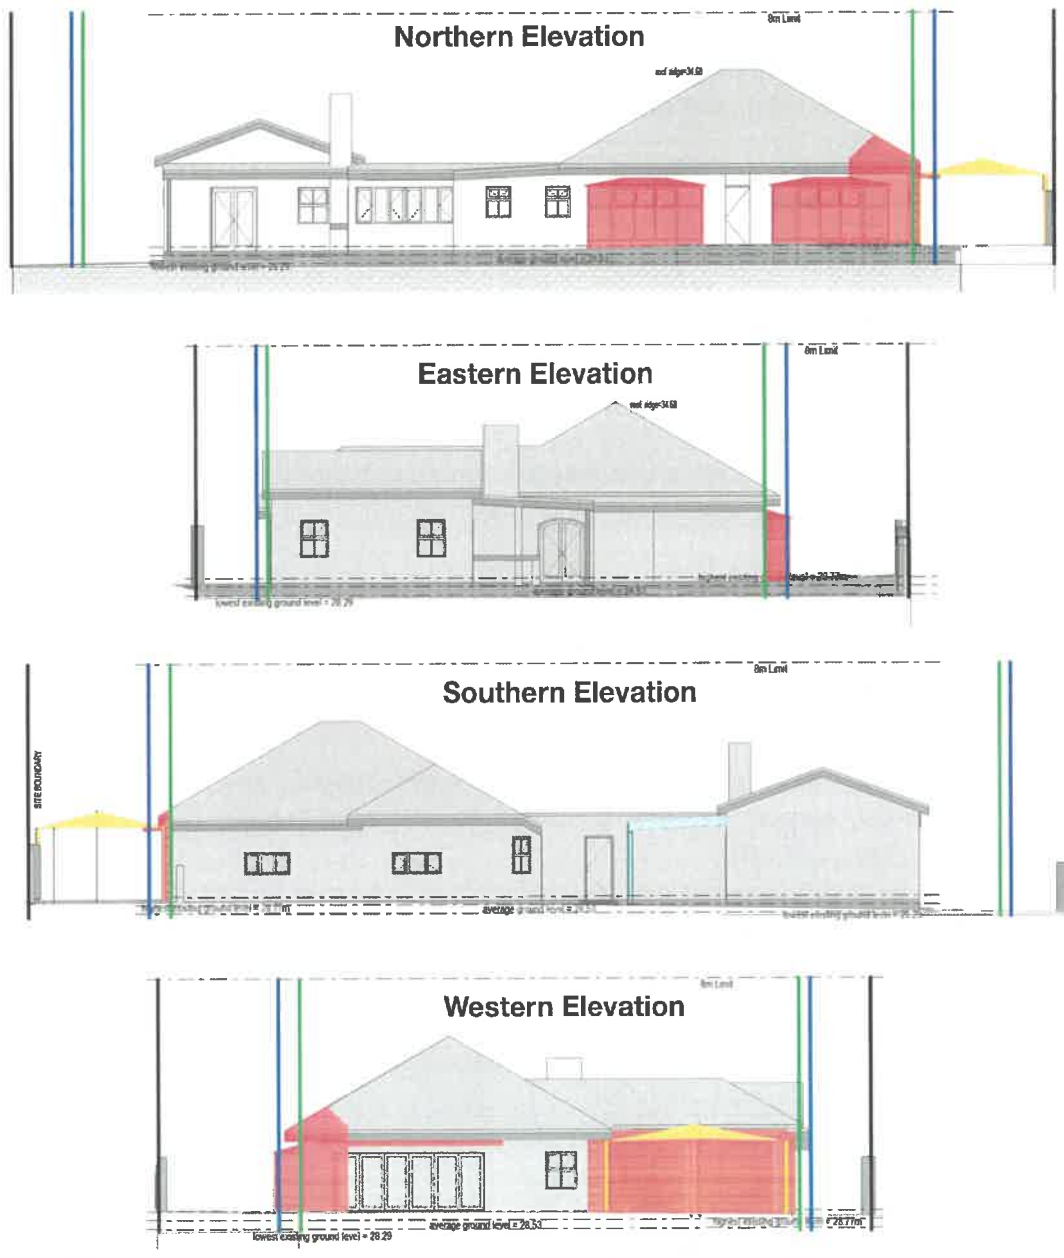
Elevations Illustrating Building Line Contraventions to be Legalised
